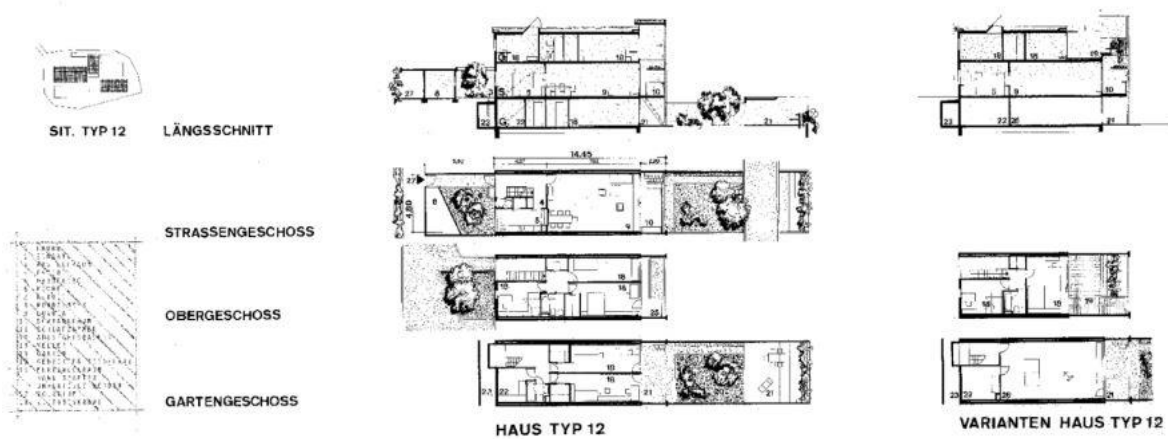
The Floor Plans of the Siedlung Halen (URL-4)
